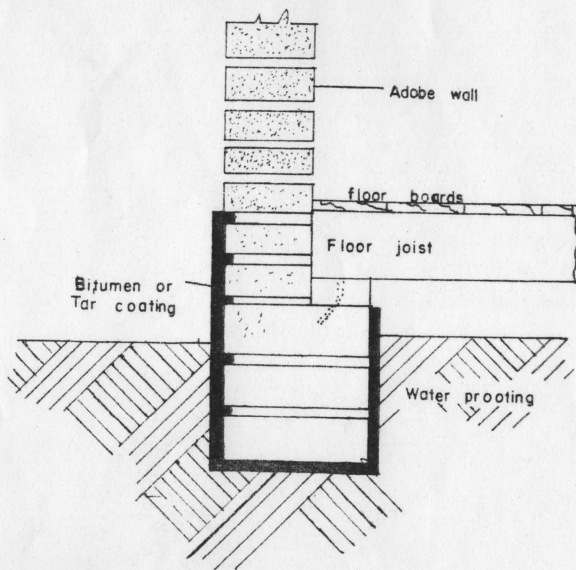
Adobe foundation for a dry climate (after ref 9)
